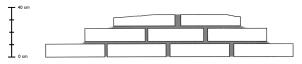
Schematic profile of a wall in Room B15 showing stretcher-stretcher brickwork.
